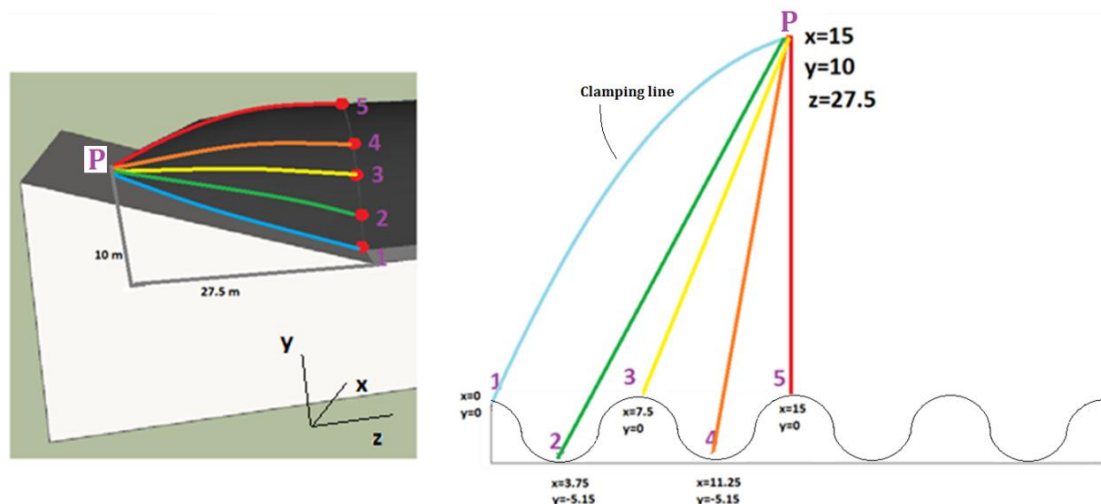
Left: inflated dam; Right: cross-section deflated dam.
